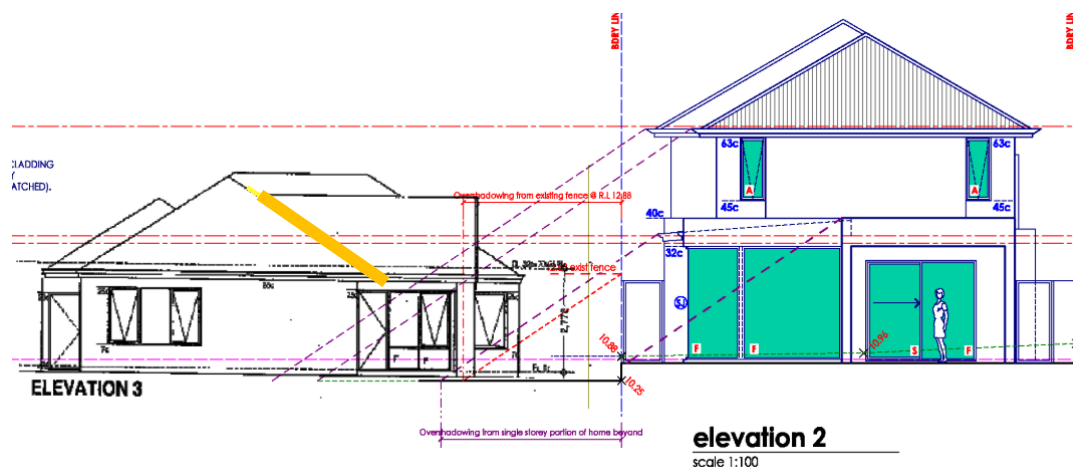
Elevation cross-section between the subject site (Elevation 2) and the southern neighbour (Elevation 3). The orange line demonstrates the approximate alignment of the solar panels which are not affected. Note the existing patio is not shown on the elevation.
